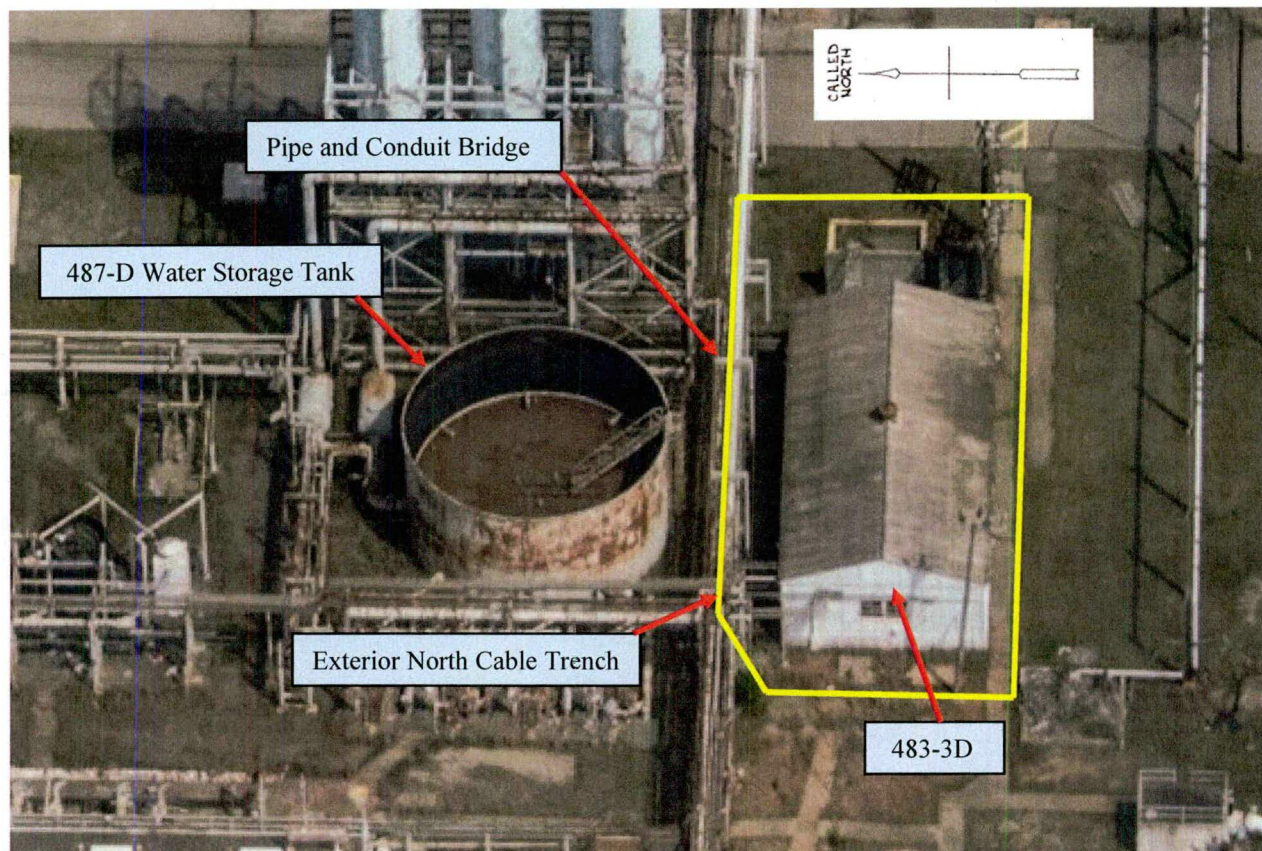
Aerial View of 483-3D and Surrounding Buildings
